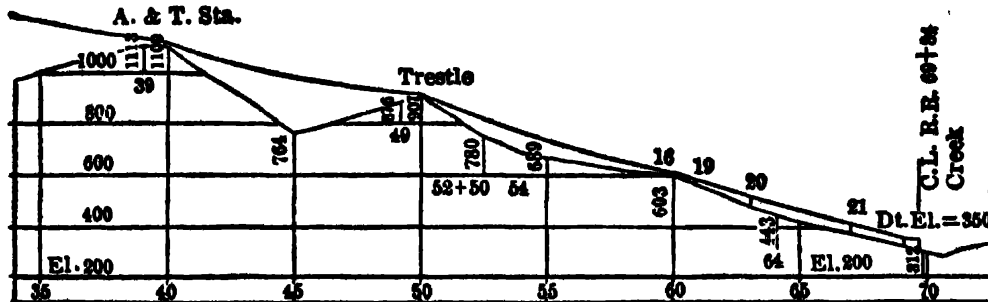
Profile of Typical Bi-cable Tramway—Continued
